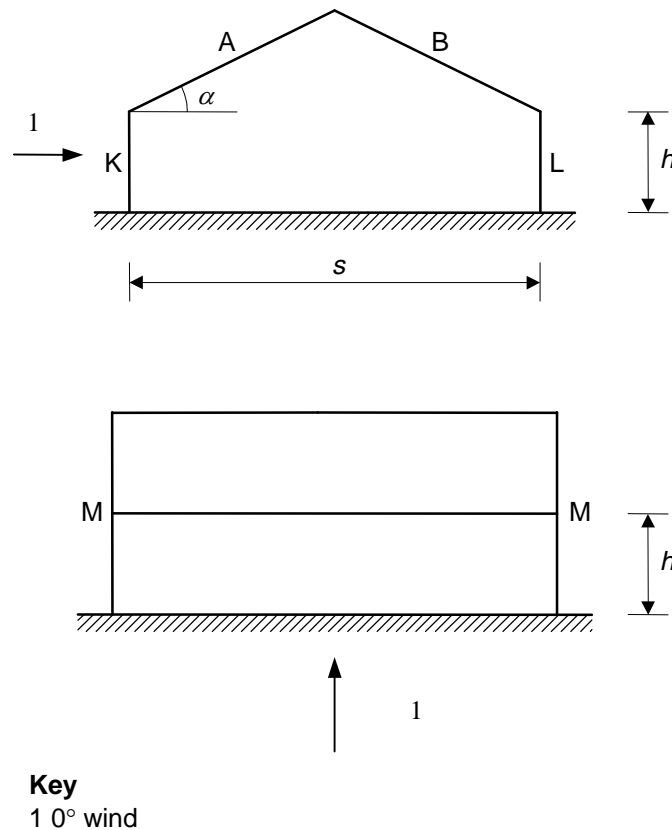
Zones for the walls and roofs of duo pitched greenhouses
